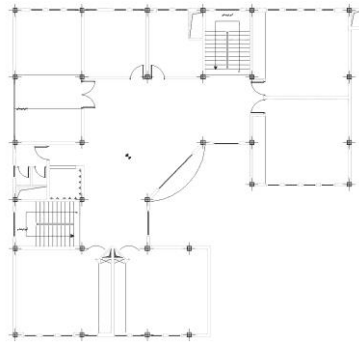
A typical floor plan of Zeinab (Nosazi madares, 2010)
